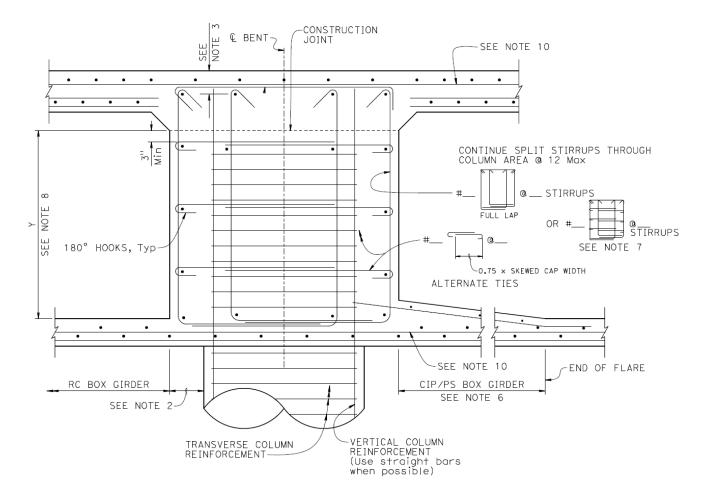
Bent Cap Section at Columns (For details not shown, see Figure 7.7.1)
